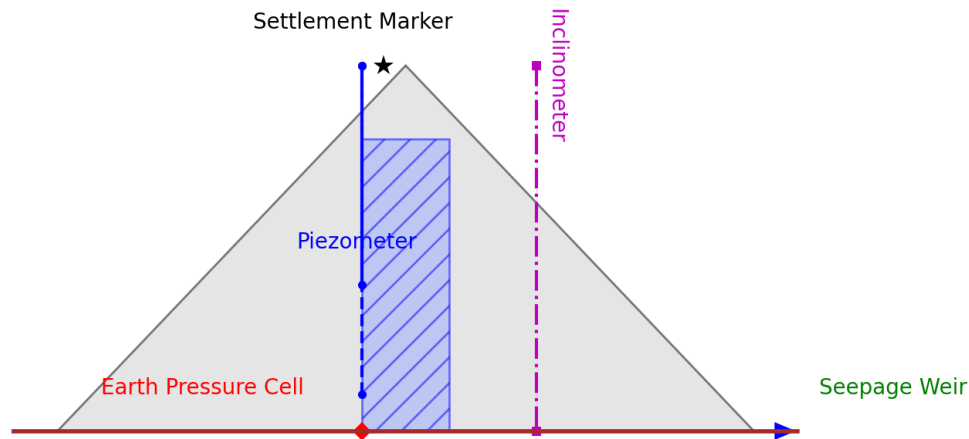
Schematic cross-section of embankment dam with typical instrumentation
